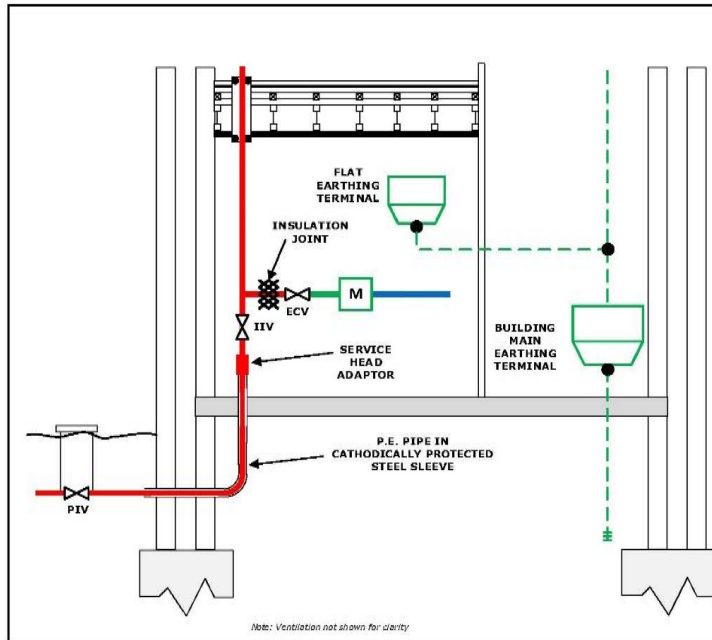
ELECTRICAL BONDING FOR ABOVE-GROUND PIPELINE BUILDING ENTRY (PE PIPE UP TO BUILDING ENTRY)
